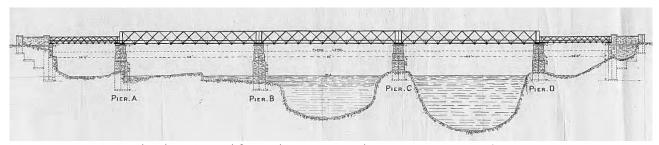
Existing bridge viewed from downstream (Source: PWD, 1885)
